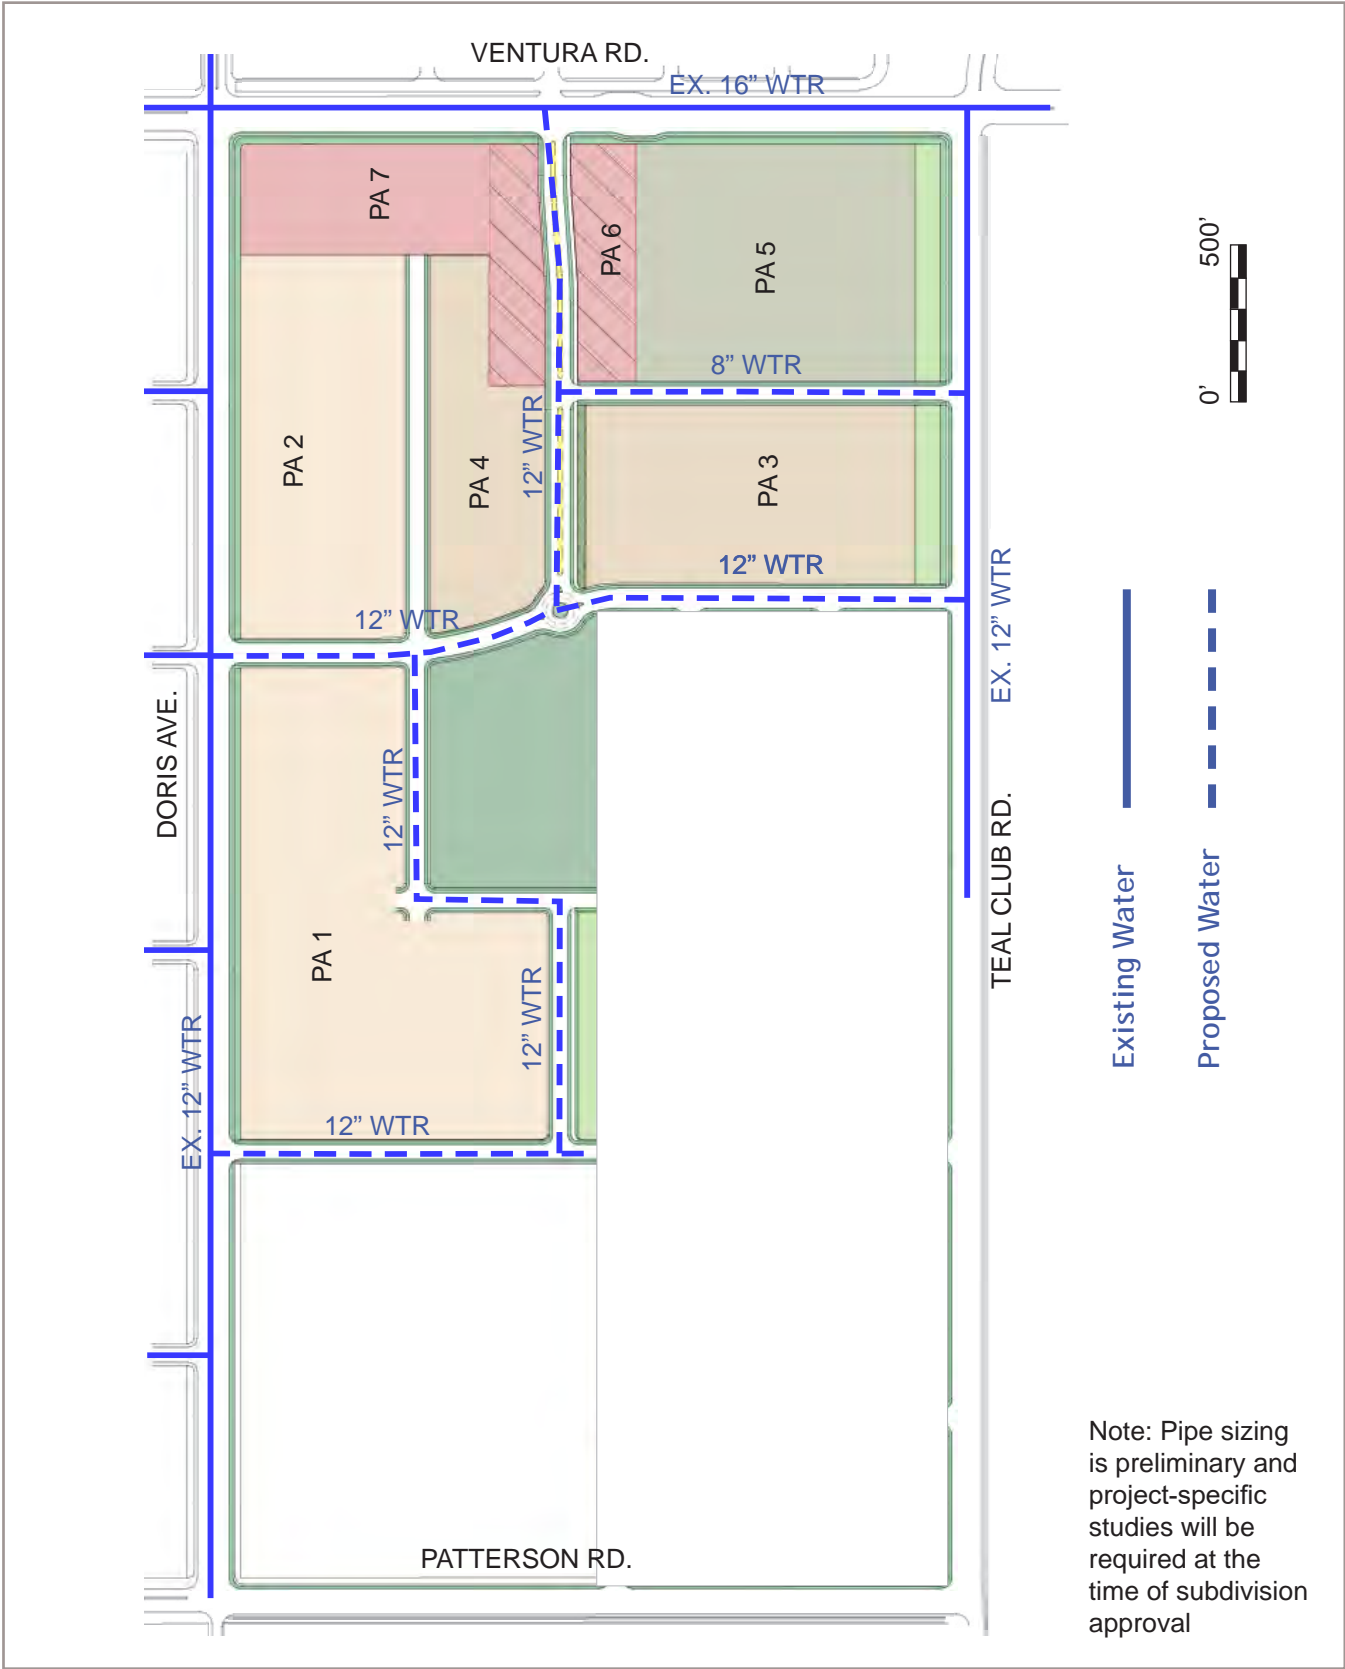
PROPOSED BUILD-OUT WATER SYSTEM
